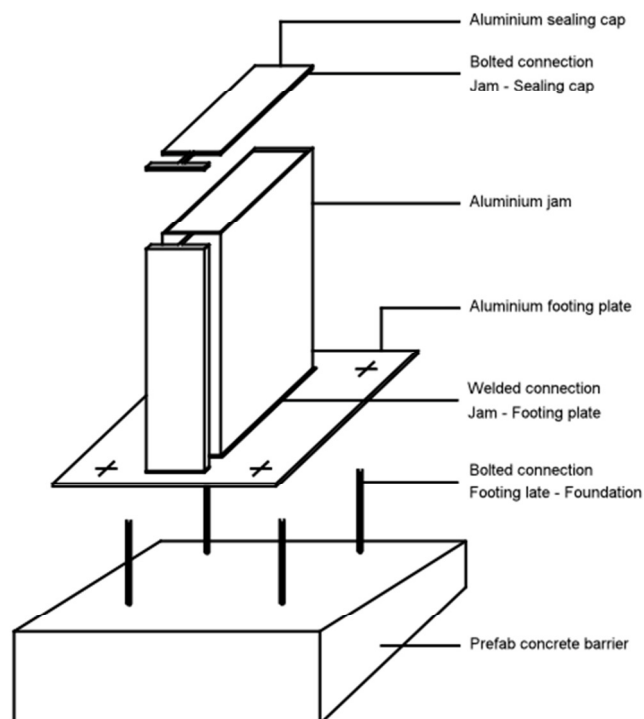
Design 4, Aluminium top element + Aluminium footing plate
